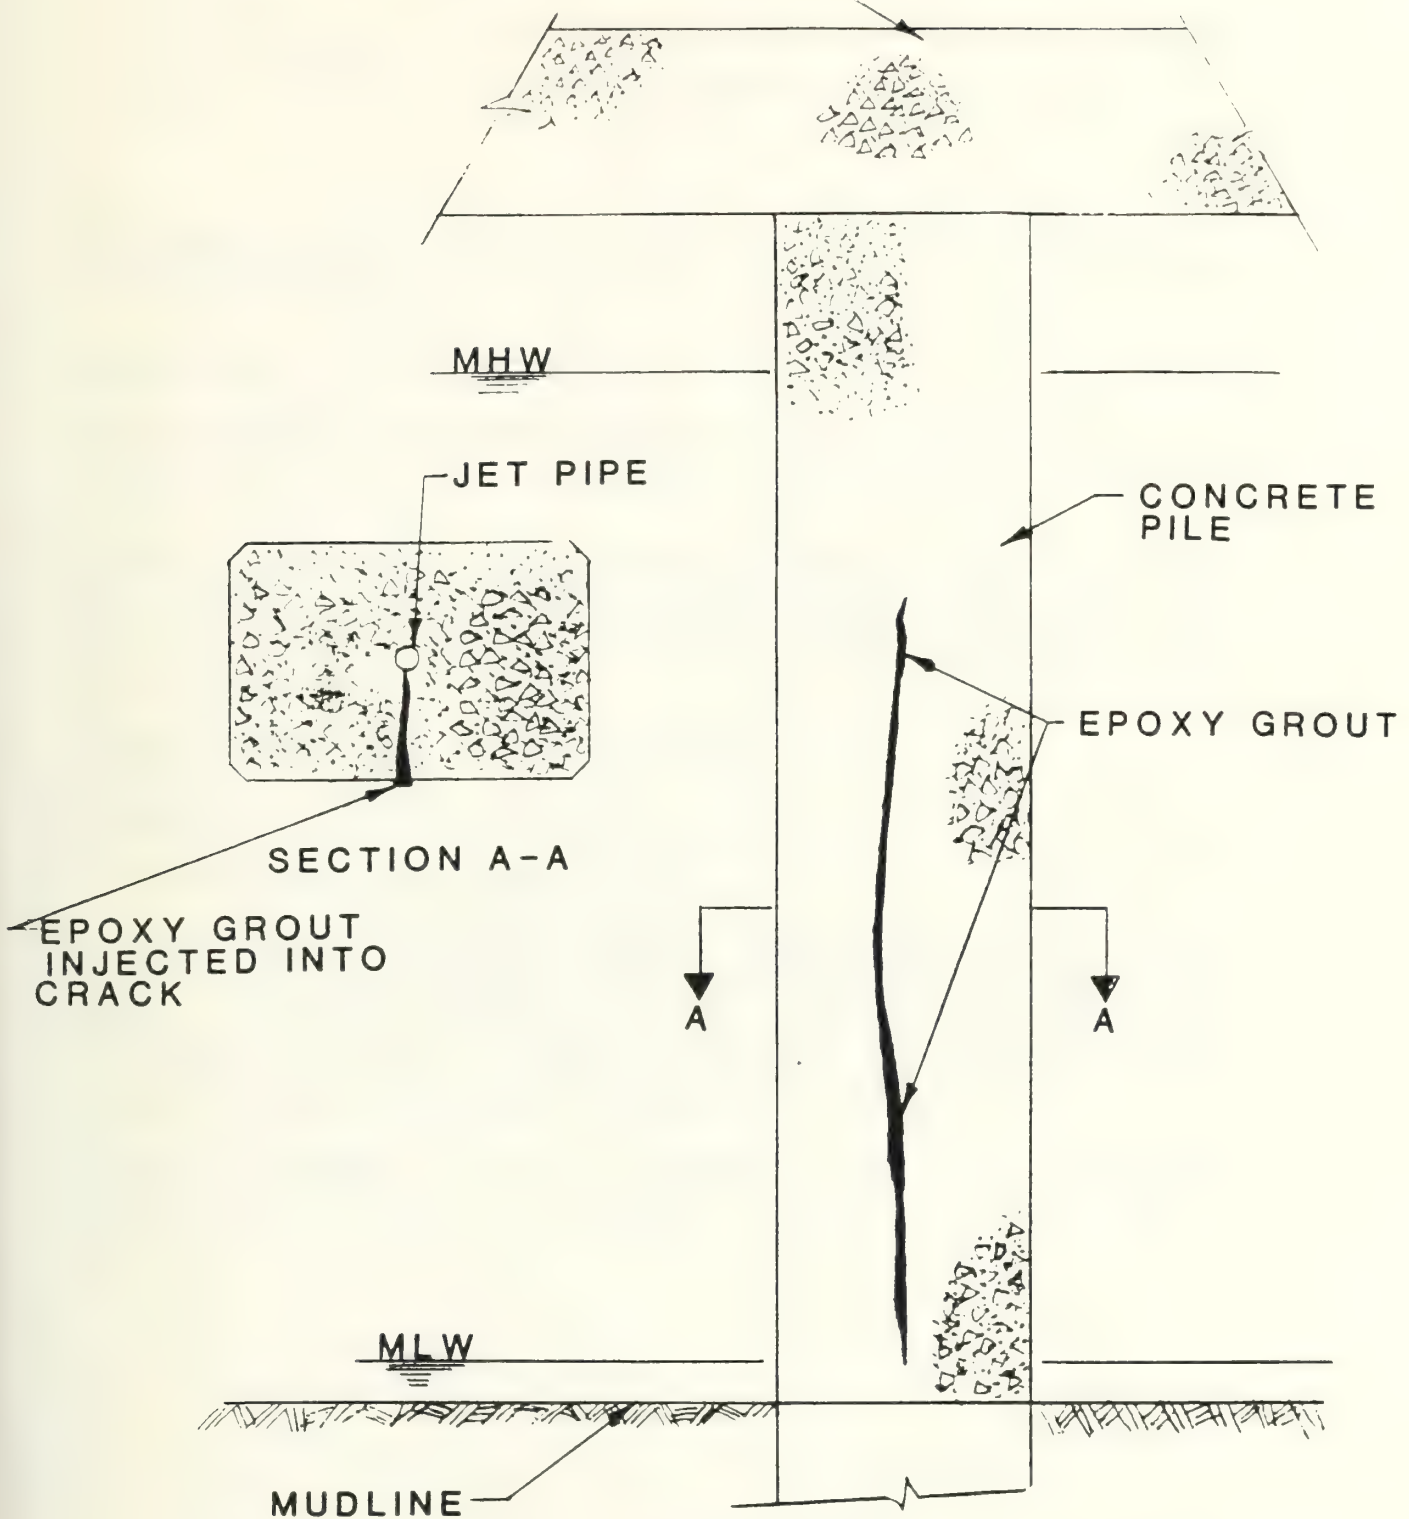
Epoxy Injection Arrangement For Damaged Concrete
